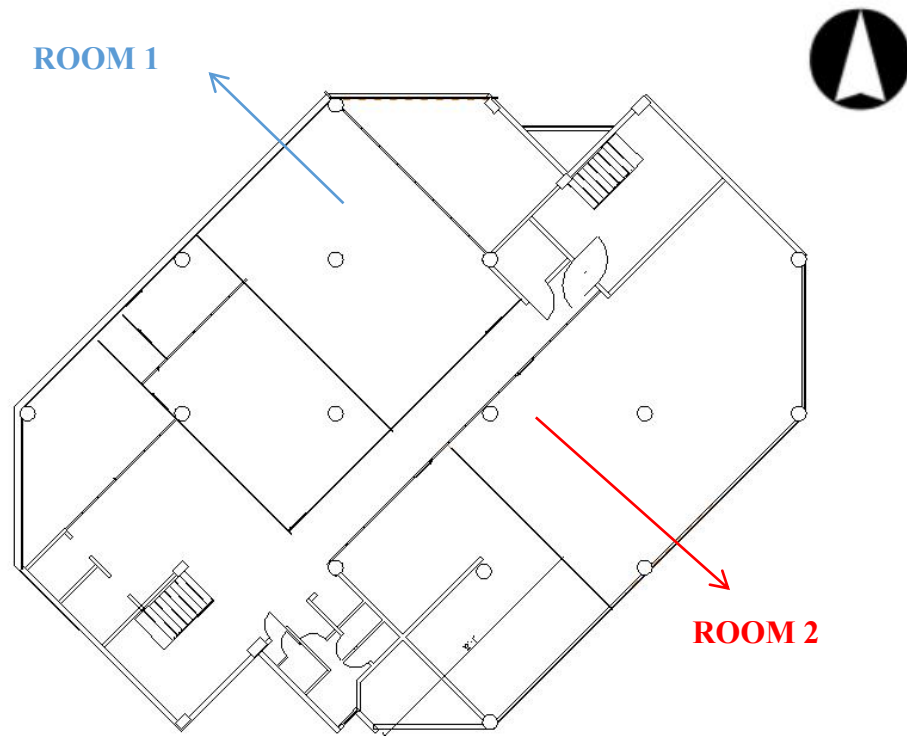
Floor plan of the selected rooms: (Source: Author, 2025)
